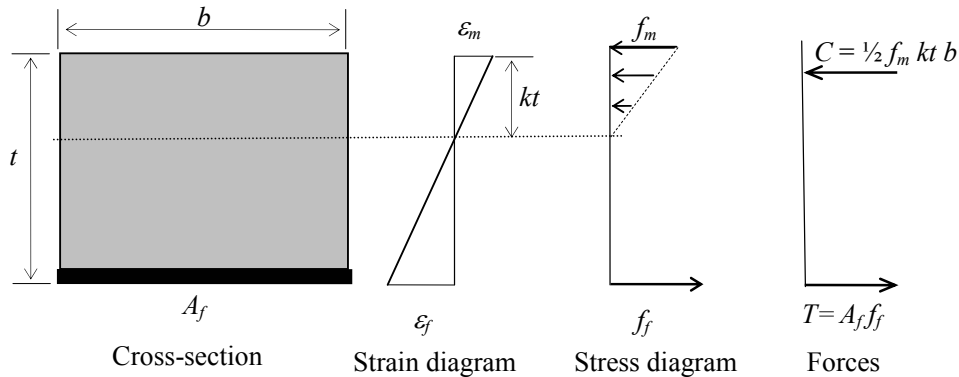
Analysis of a wall section bonded with FRP laminate
